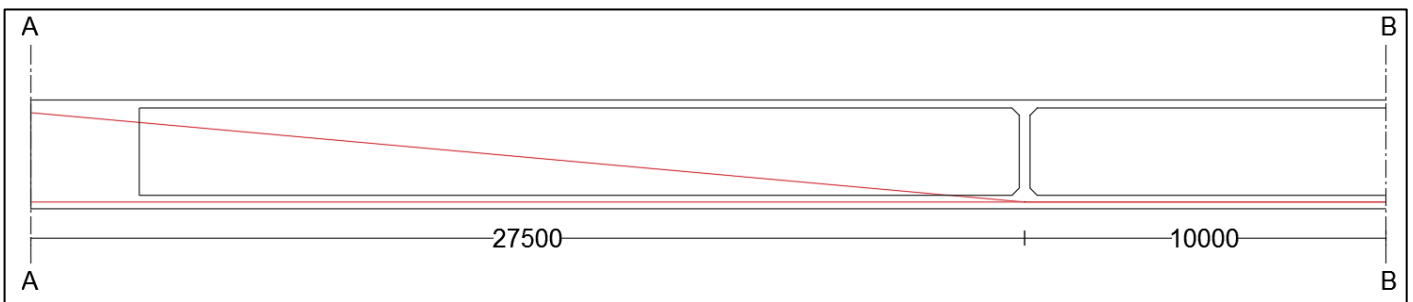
Longitudinal cross-section of the beam; tendons are sketched in red.
